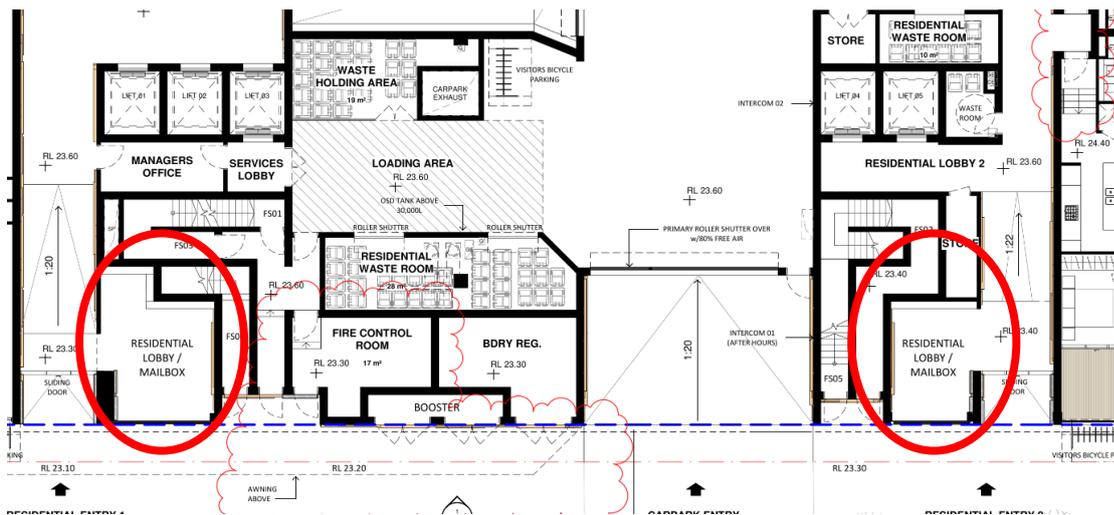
The amended ground floor plan, with the location of the mail rooms and their impact on the lobby entrances highlighted
